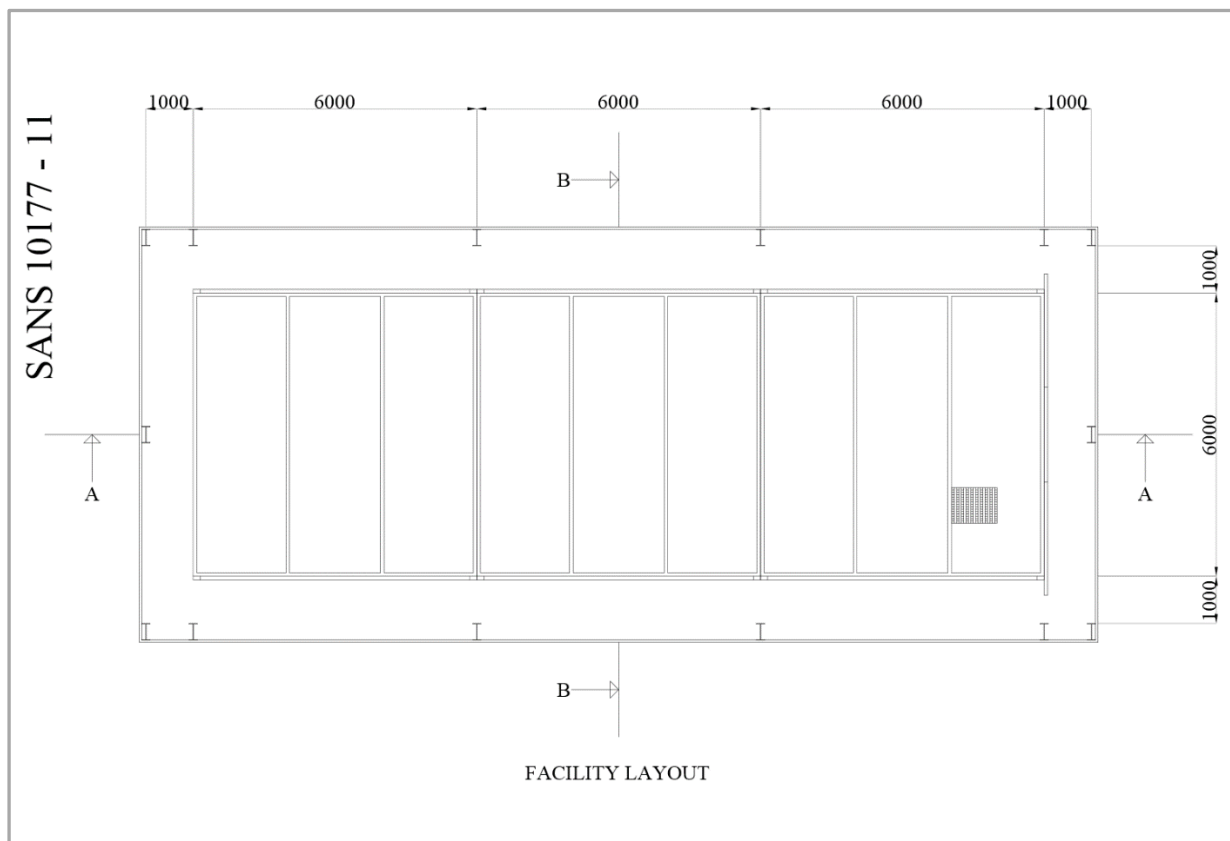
SANS 10177 – 11 test facility with specimen frames
